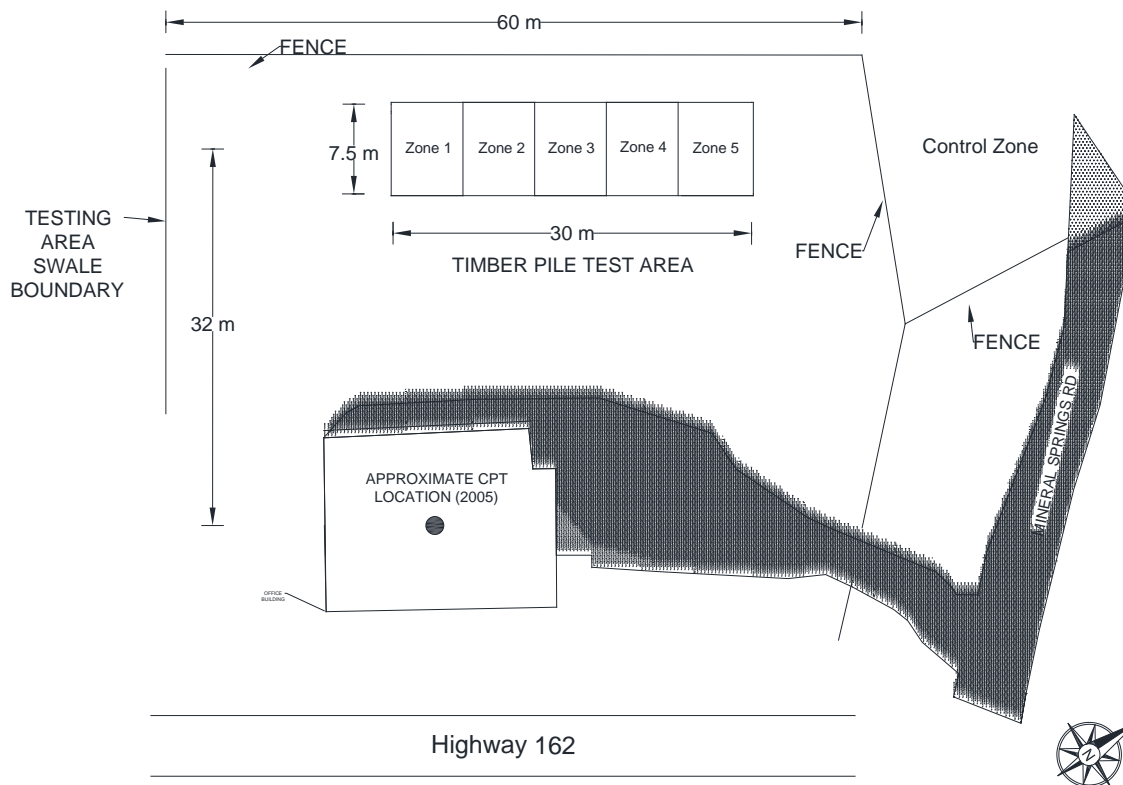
General layout of the test site indicating the location of the timber pile test area (Zones 1–5) and the control zone.
